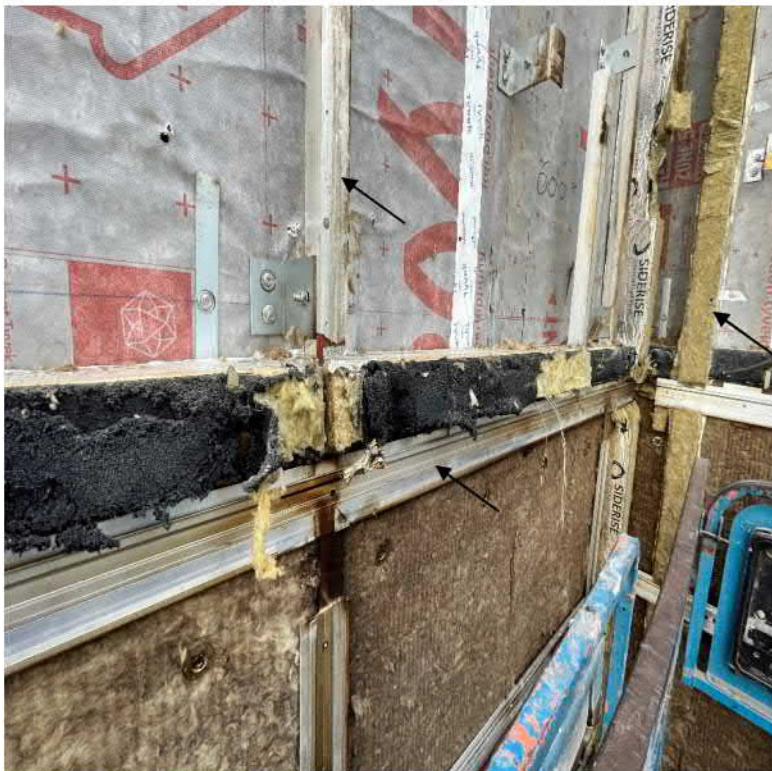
Siderise cavity barriers, Knauf Rocksilk insulation and Alubond RFS railings at level 2
